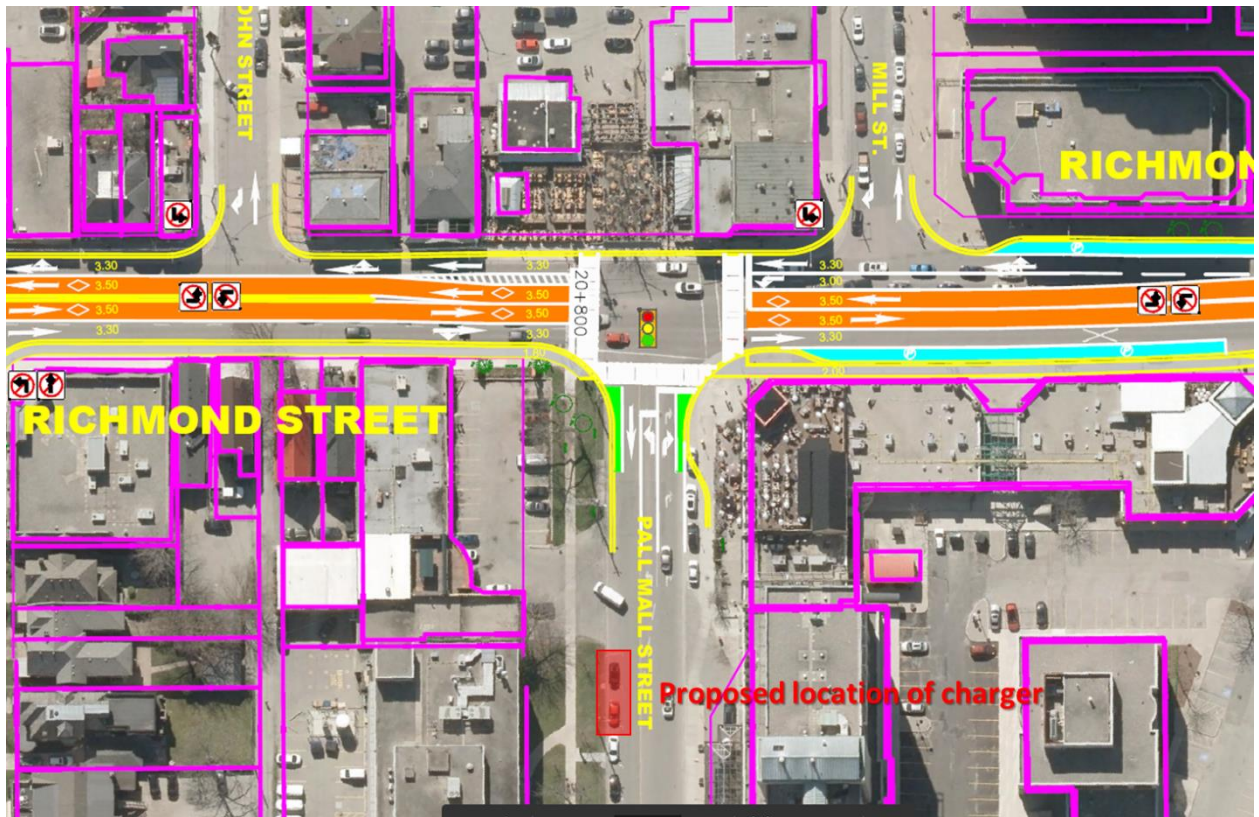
Location for Pall Mall Street Curbside EV Charging Station
